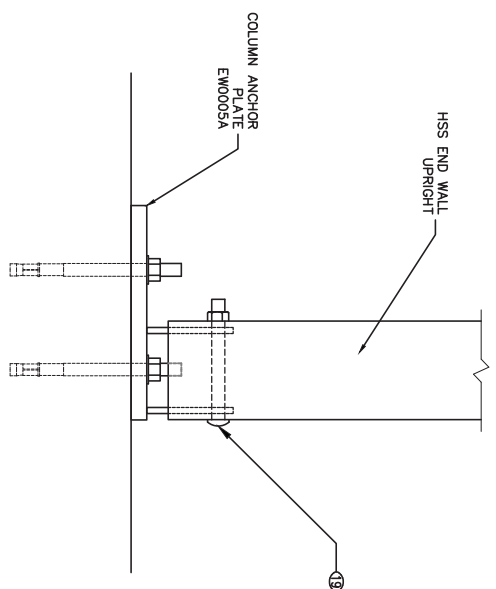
UPRIGHT BASE BRACKET CONNECTION (END WALL)
